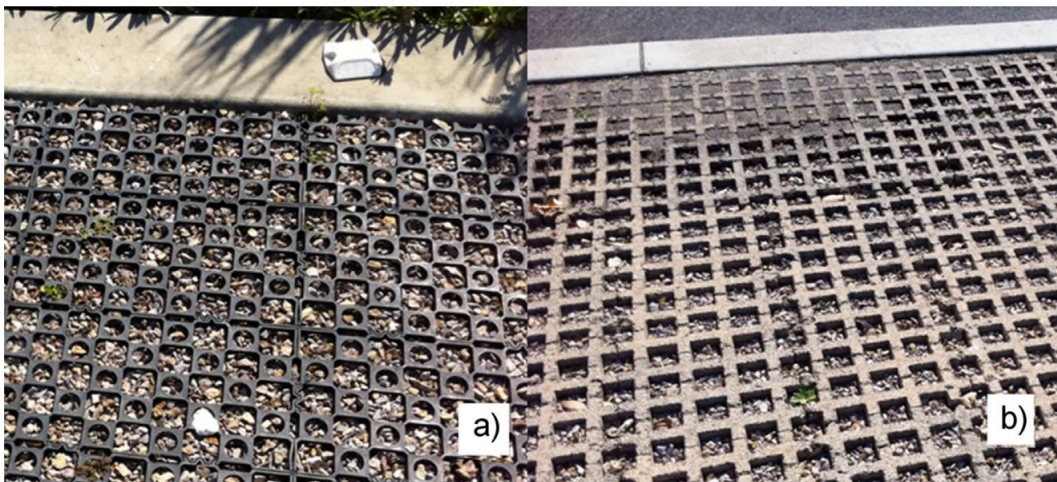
Concrete and plastic grated pavers. (Silva & Costa, 2016)
